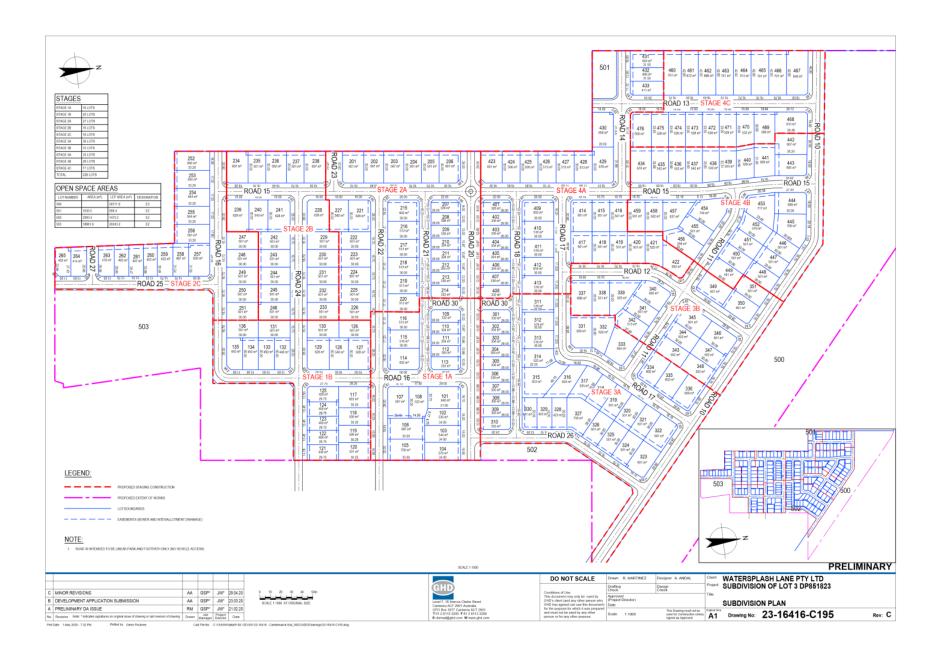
Site in relation to Indicative Layout Plan (ILP)
